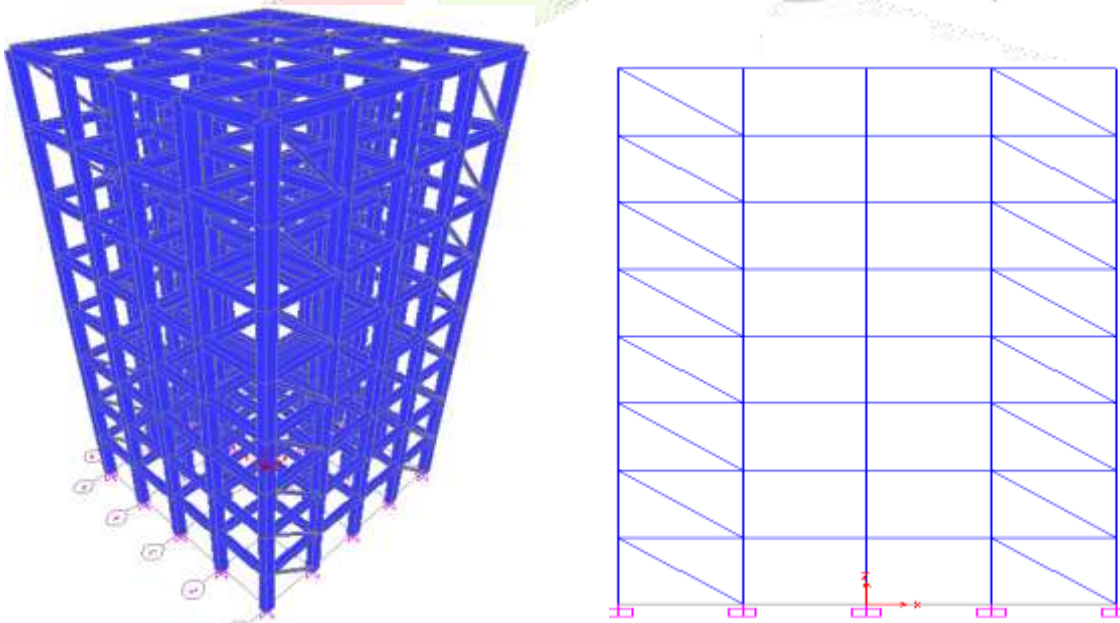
3-D and Elevation View of Eccentric braced Frame Structure
